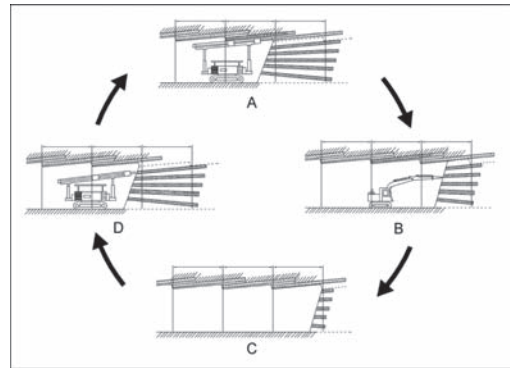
Tunneling sequence by the canopy technique: A—reinforcement of tunnel contour by jet grouting and/or steel micropiles, B—excavation, C—excavation completed, D—face reinforcement by jet grouting and/or fibreglass bars or tubes (optional).
